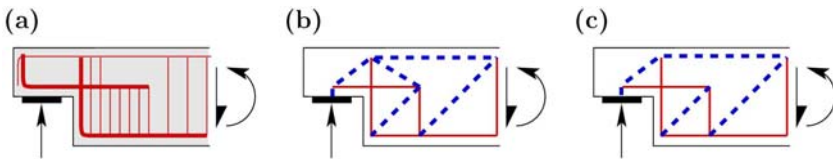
Various strut and tie models for a structural member with a given reinforcement layout: (a) dapped-end beam geometry, loads and reinforcement layout; and (b,c) possible strut and tie models
